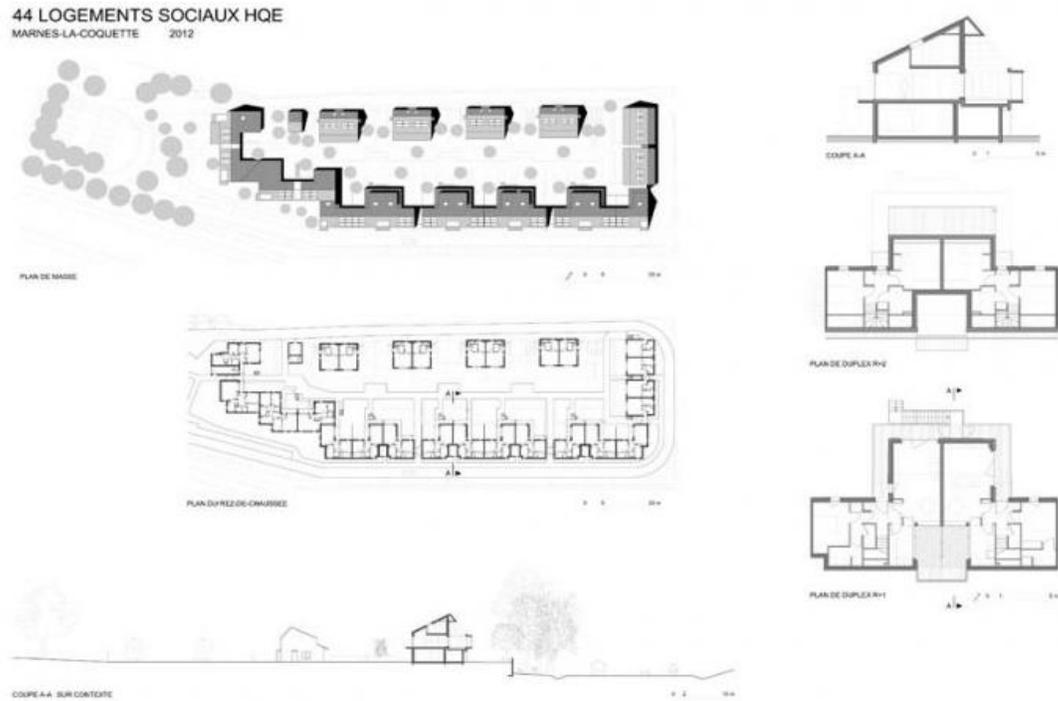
Marnes-la-Coquette social housing. Master plan, section
